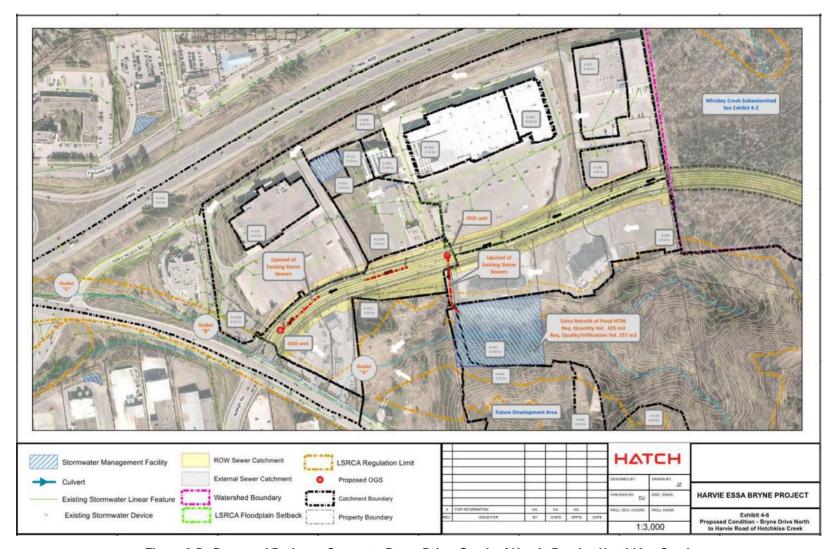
Proposed Drainage Concept - Bryne Drive, South of Harvie Road at Hotchkiss Creek
